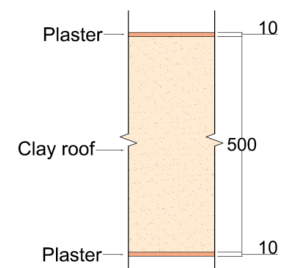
M5 roof cross-sectional detail. All dimensions are in millimetres.
